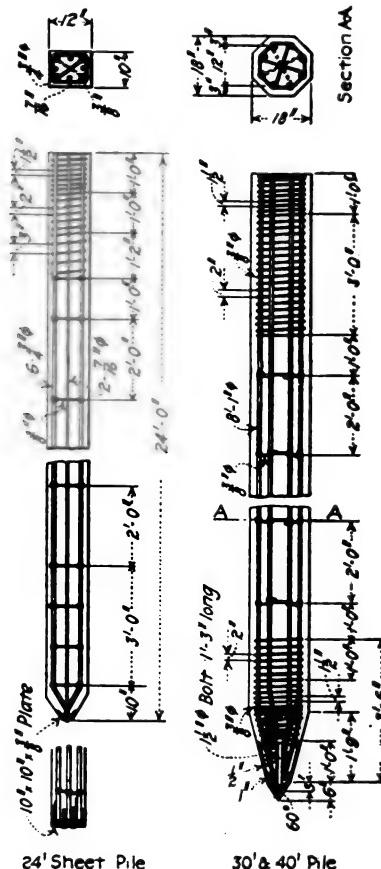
Details of piles used in ore dock construction at Cleveland.
